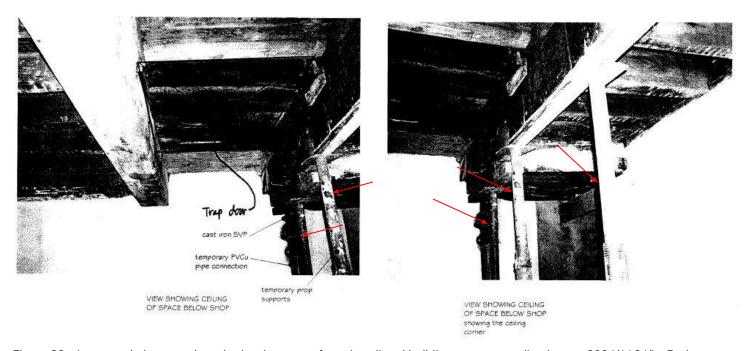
Annotated photographs submitted as part of previous listed building consent application no. 2004/1164/L. Red arrows point to temporary construction props being used.
